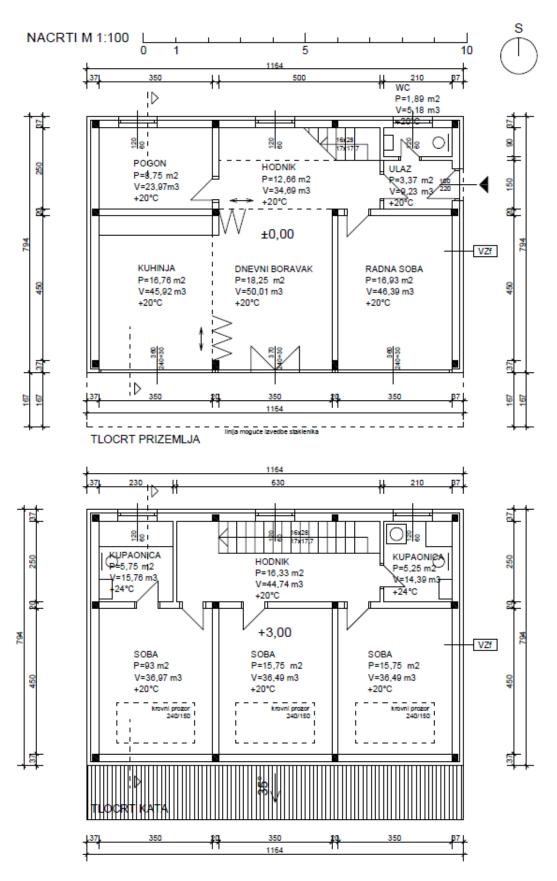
Floor plans - GROUND FLOOR and UPPER FLOOR
